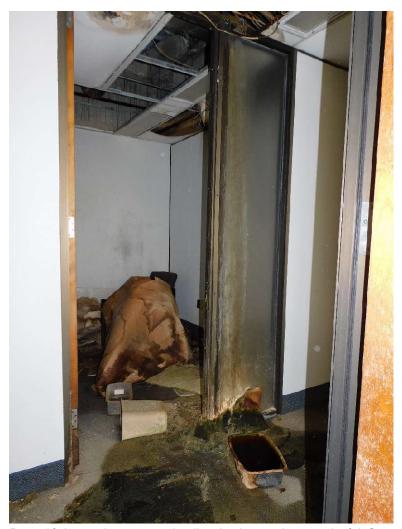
Image showing typical wall and ceiling condition on the 8th floor.
